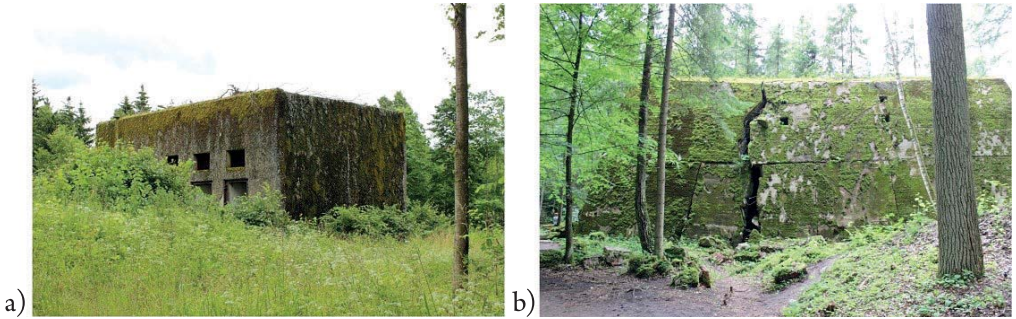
a) Building of electric transformers in Mamerki, b) view of separated but entirely preserved wall of heavy bunkers (own photos)
